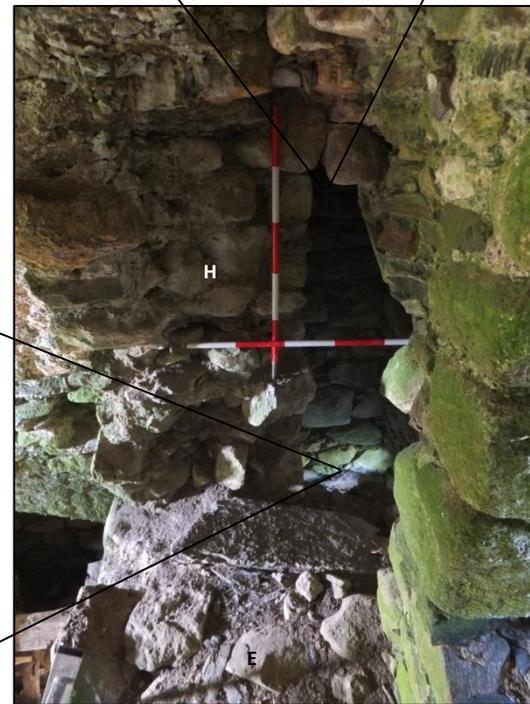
Chute looking down towards Ground Floor from the First Floor over Vault - the opening in the East Elevation is visible to the right.
